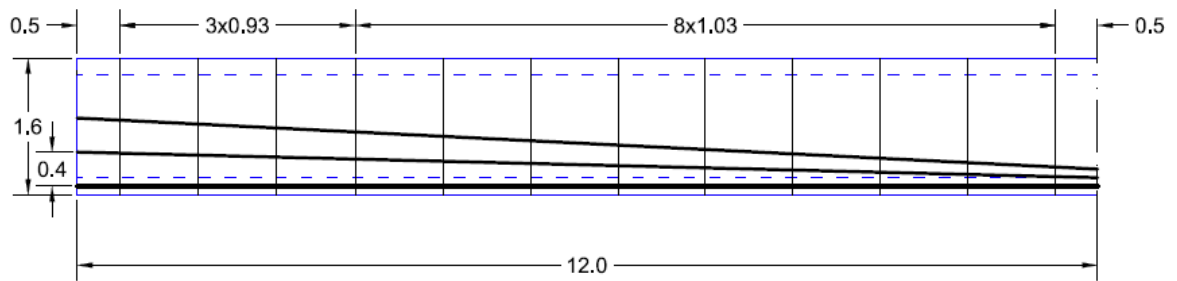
Web reinforcement. Lateral and transvers reinforcement in the slabs not shown.
